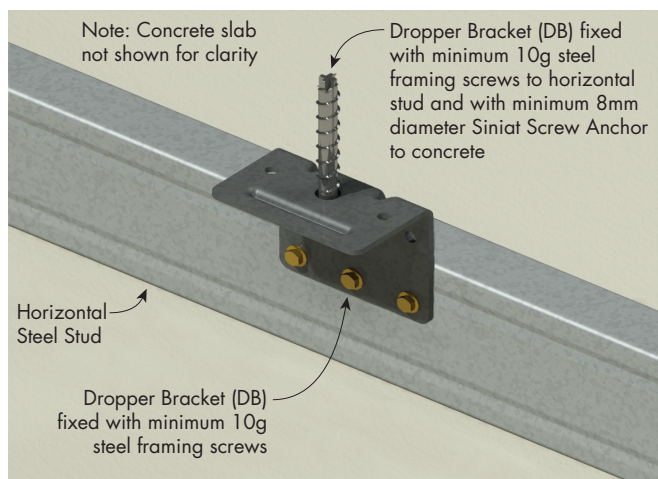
Stud Ceiling Type A2 - Fixed / Sliding
